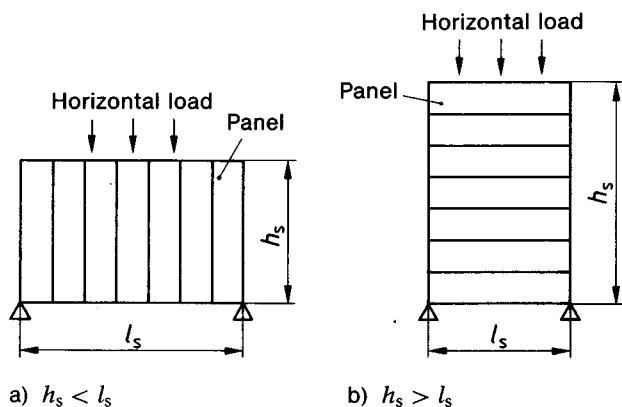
Examples of roof and floor plates of panel construction (plan view); dimensions and loading direction
